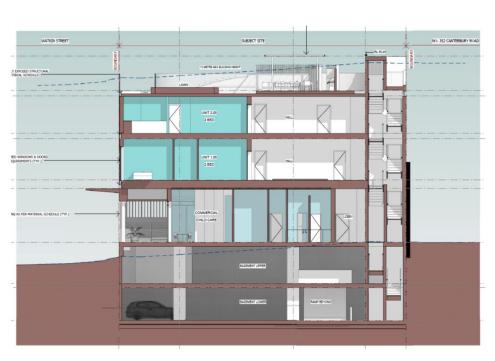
Section indicating extent of lift overrun above 13m height limit (looking west)
